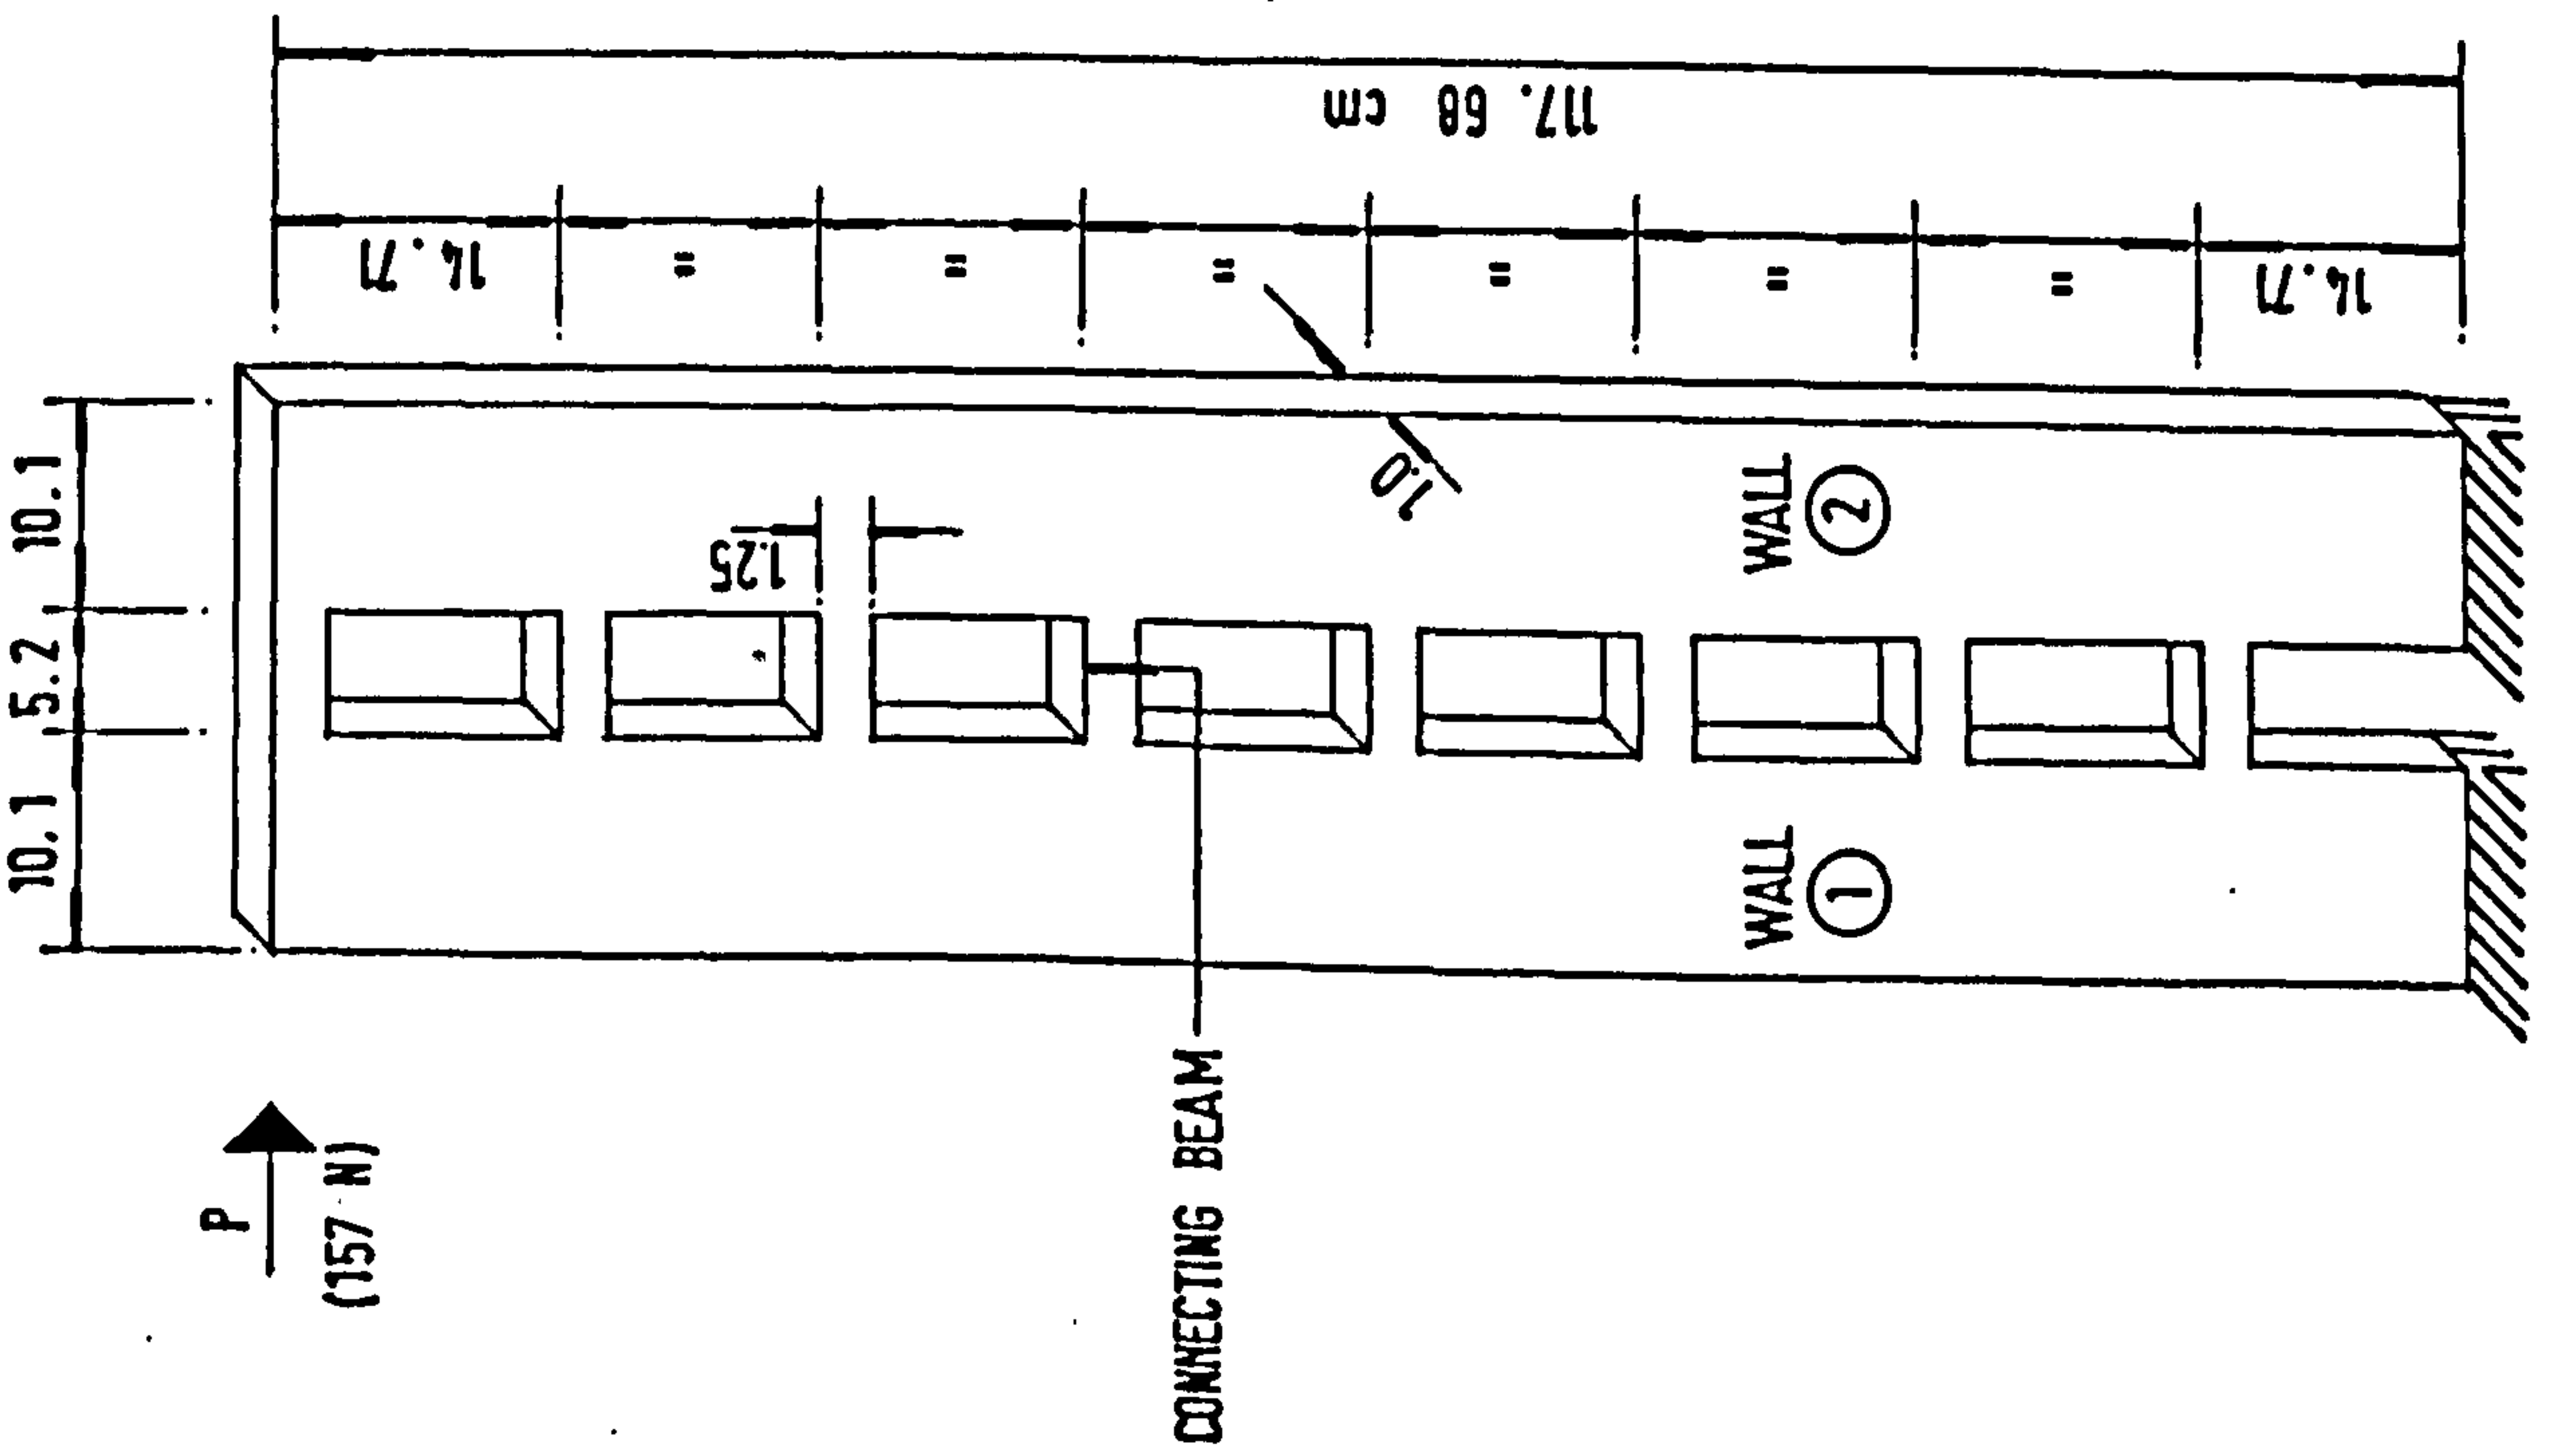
COUPLED SHEAR WALL MODEL ⑪
